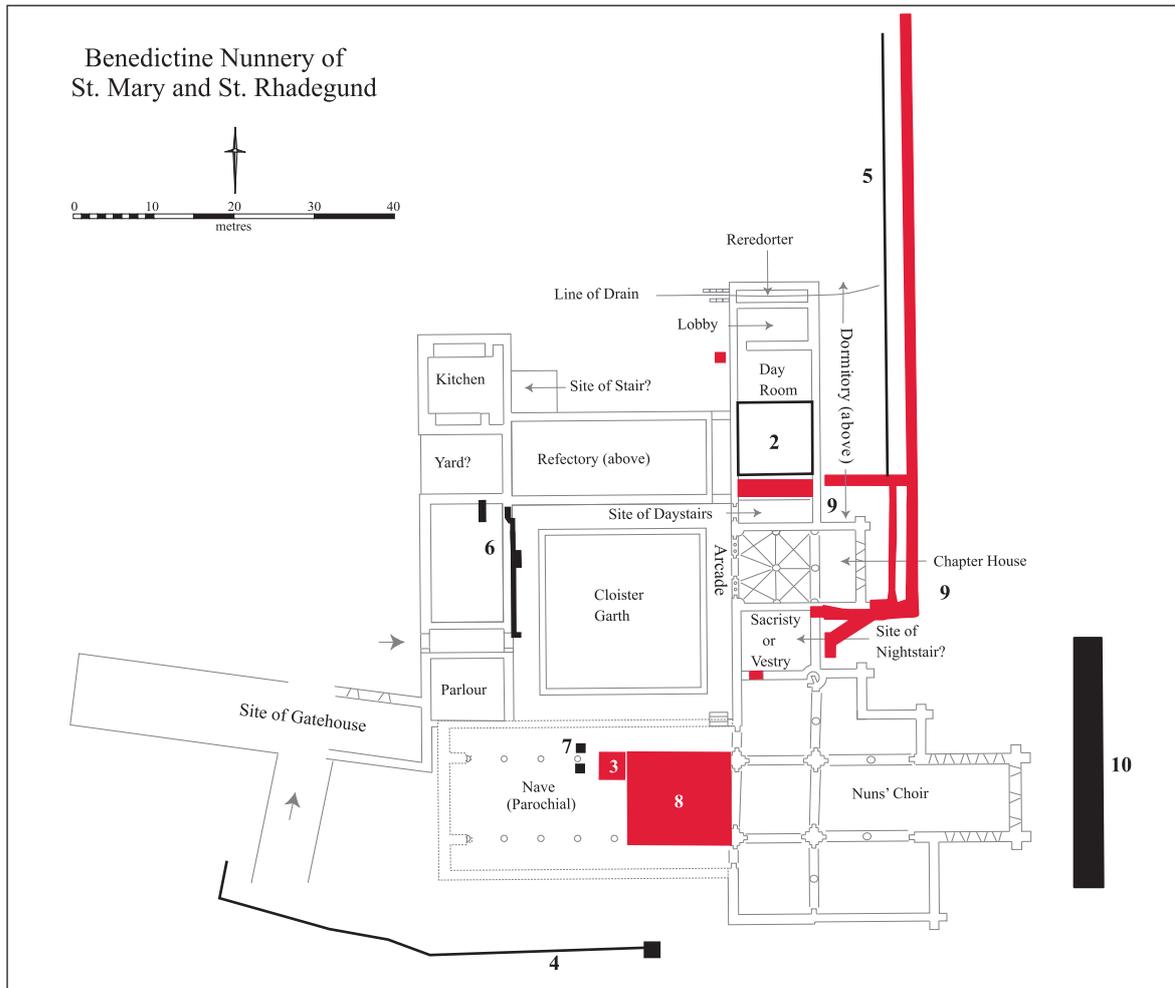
Reconstructed plan of monastic complex, c. 1250. Note that the first floor dormitory extended above the entirety of the east range, including the chapterhouse.
